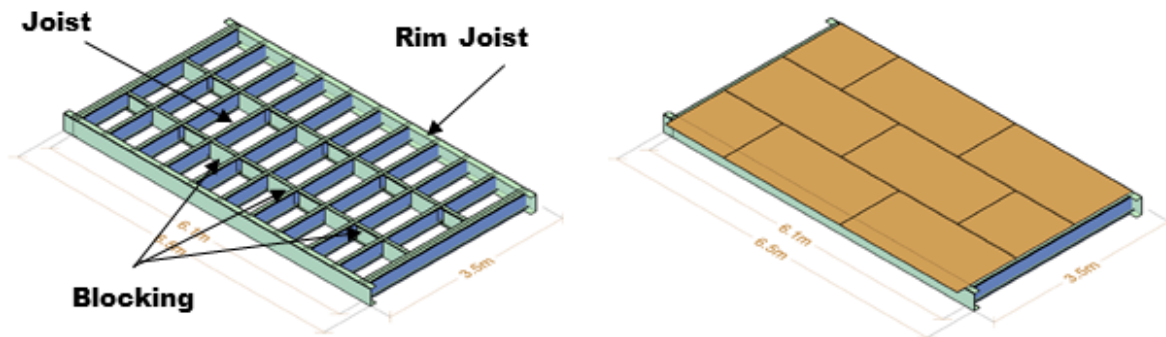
Bare Frame and Frame with Sheathing: Specimen 13-FB4-M
